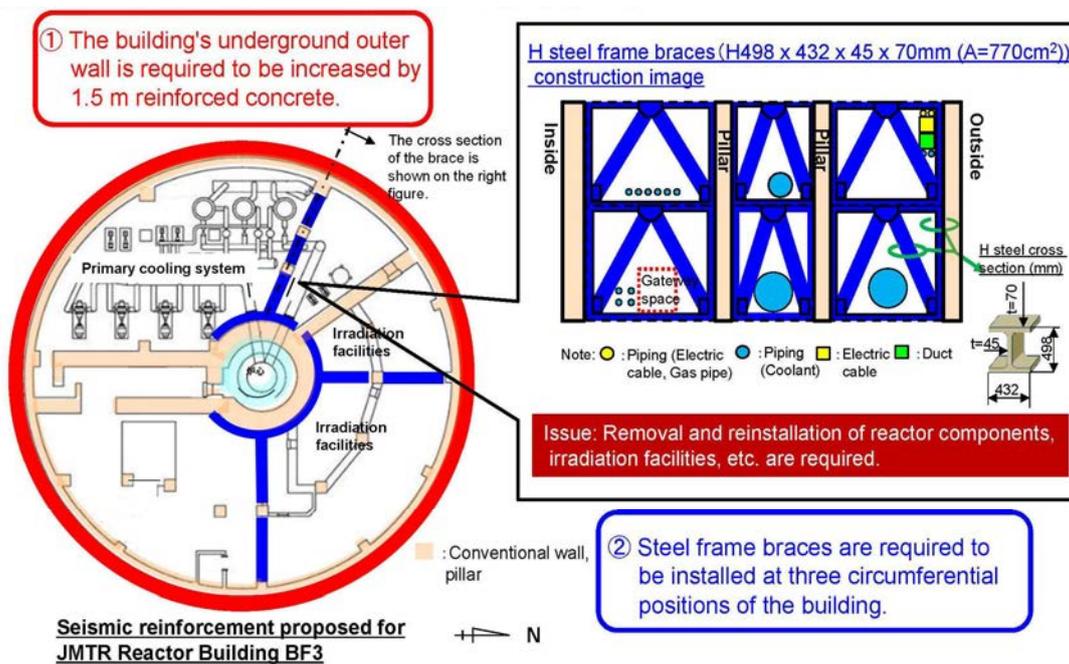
Seismic reinforcement of the JMTR reactor building, horizontal cross-sectional view.
